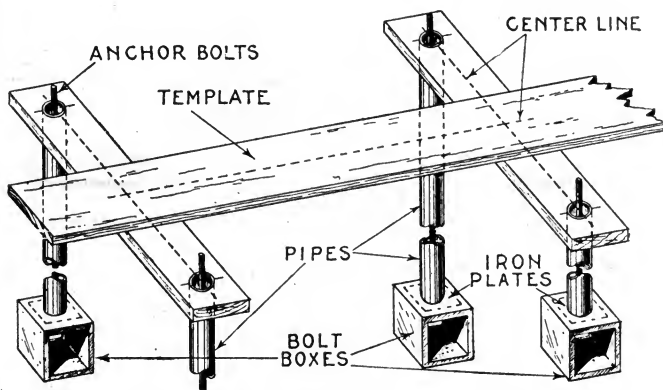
,126.—View showing part of template for locating anchor bolt centers, pipes through which the bolts pass and bolt boxes at lower end of bolts. The completed foundation is shown in fig. 2,127, with template removed. The template is made of plain boards upon which the center lines are drawn, and bolt centers located. Holes are bored at the bolt centers to permit insertion of the pipes as shown.
